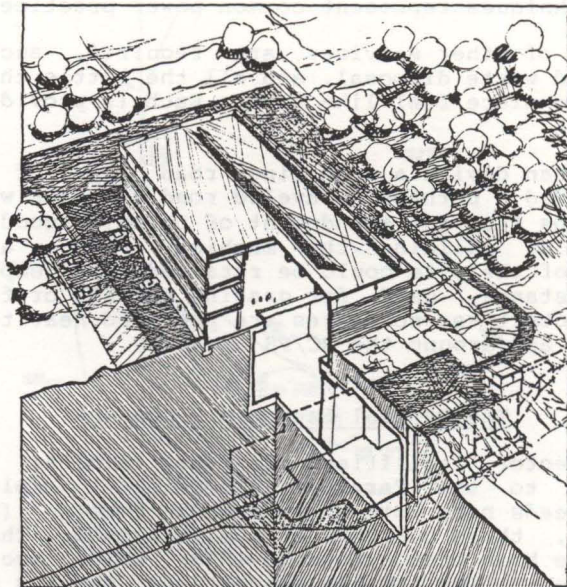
Aerial view of staging building and cut away of collision hall. The staging building is 125 feet x 300 feet.
